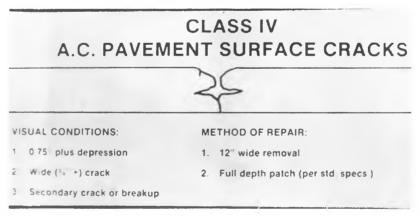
A Class 4 crack has these visual conditions: Usually 3/4 in. or more depression, the crack is 3/4 in. or more wide. It has a secondary crack or area of breakup adjacent to the crack. The method of repair is to remove the pavement 12 in. wide full depth and replace it with an asphaltic concrete patch per our standard specifications.
